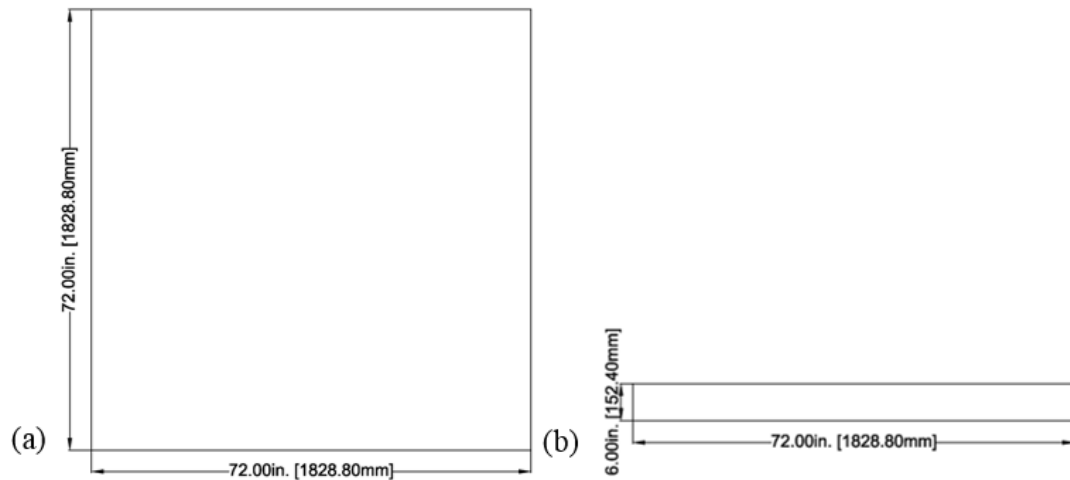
Schematic diagram of concrete plate: (a) plan view; (b) elevation view.
